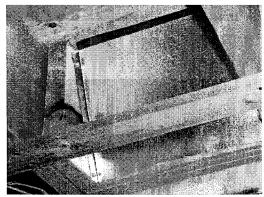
,010.jpg</u>, shows a very typical direction change encountered on site. In this case two supplies are required in rooms on main floor rooms located behind the garage. If the designer is not familiar with framing layout, the two extra 90 deg. elbows required, may be missed in the duct design process.
